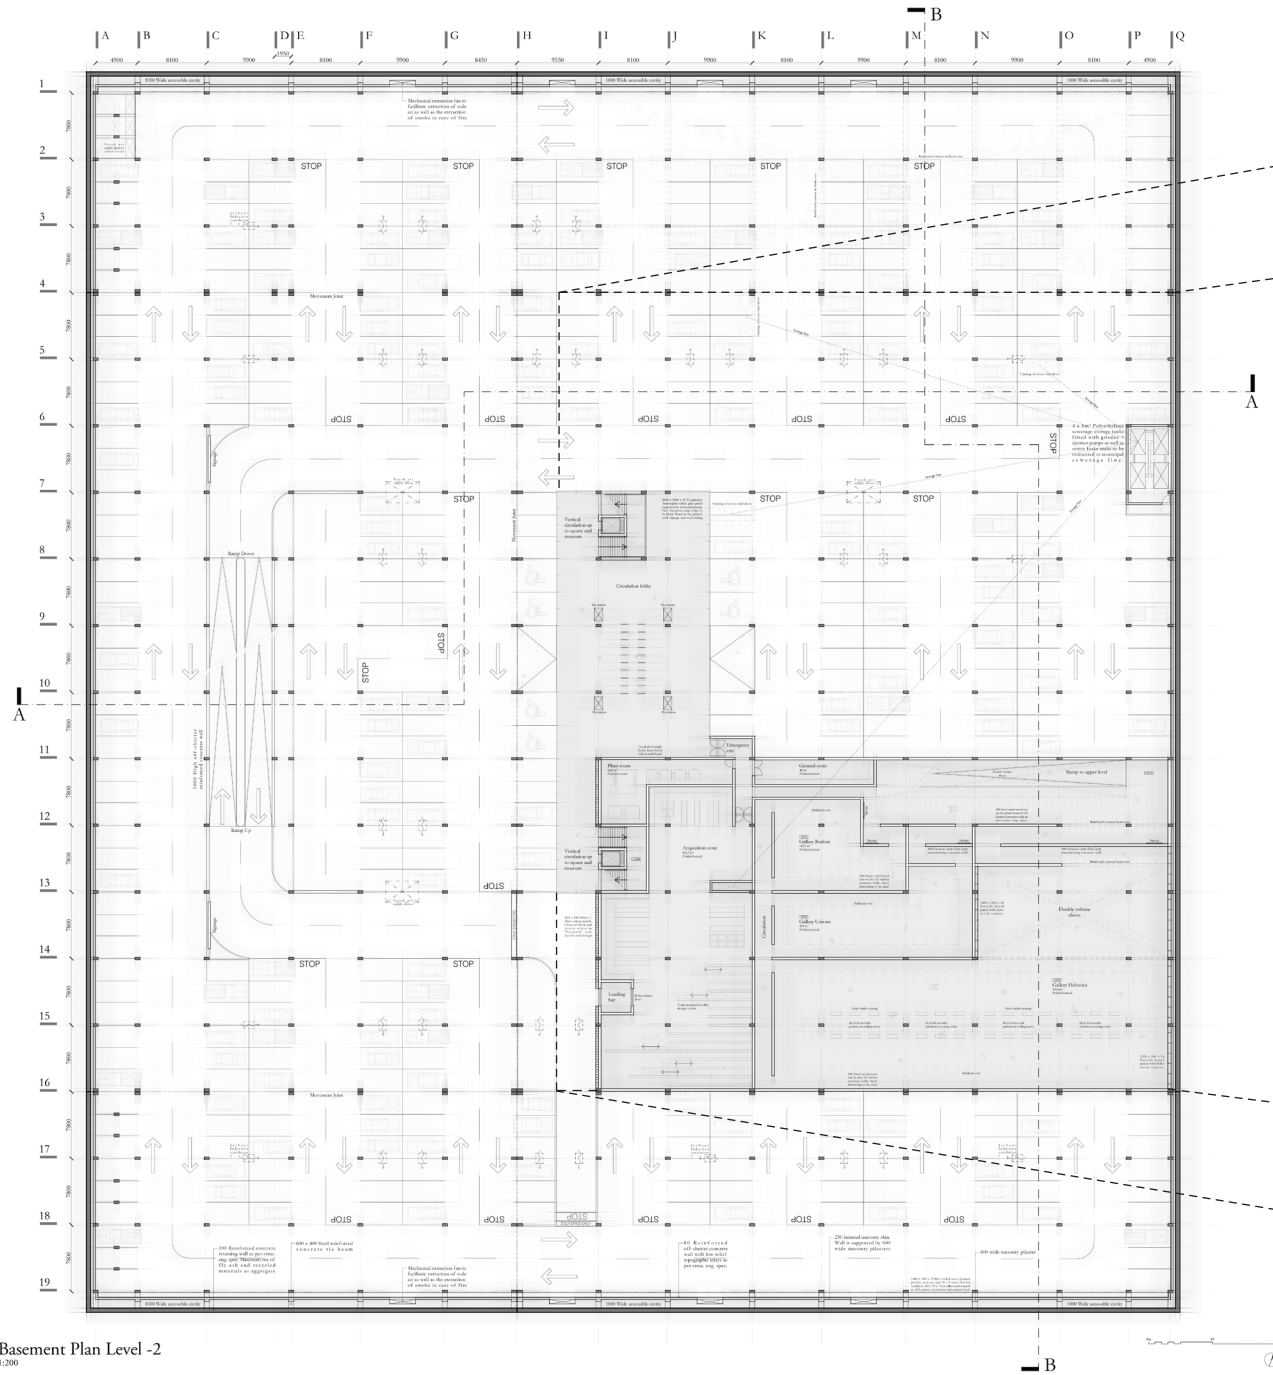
Second subterranean floor of proposed new precinct . Not to scale (Author, 2011).
